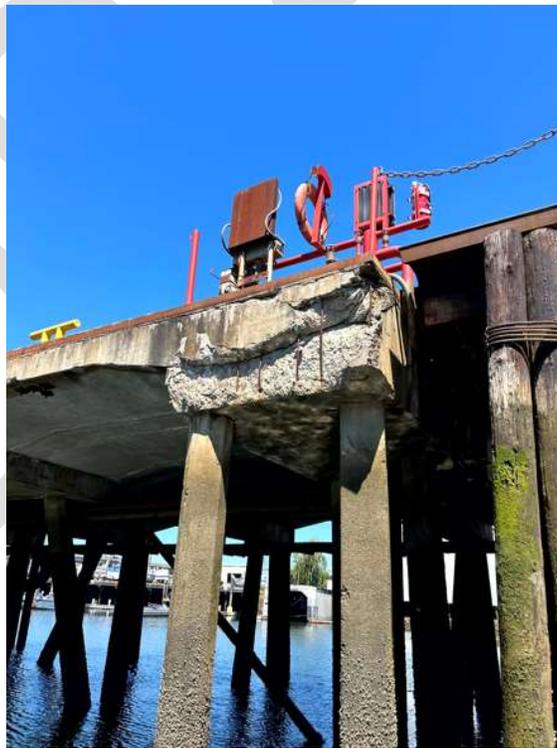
Pile cap damage at south side of finger pier
